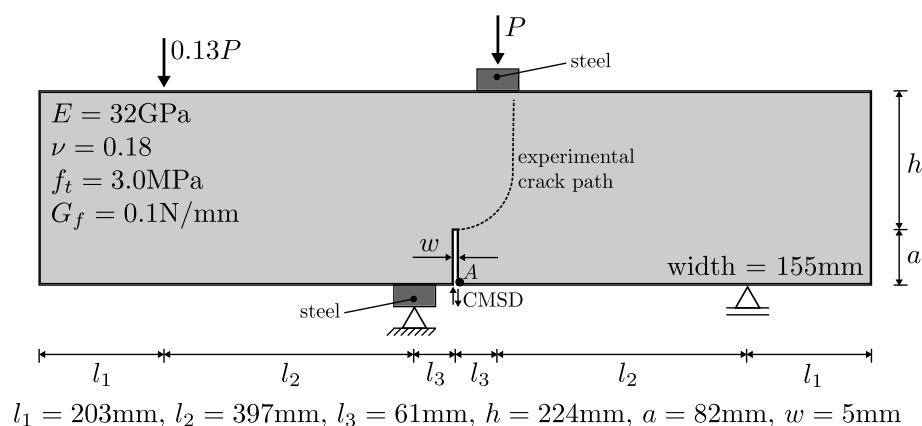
Example 1 – Arrea and Ingraffea experiment: four point bending of a notched concrete beam.
